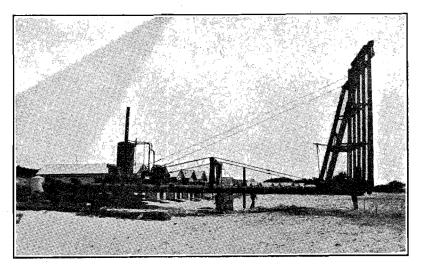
Pile Driving Plant used at Barwon Heads.
